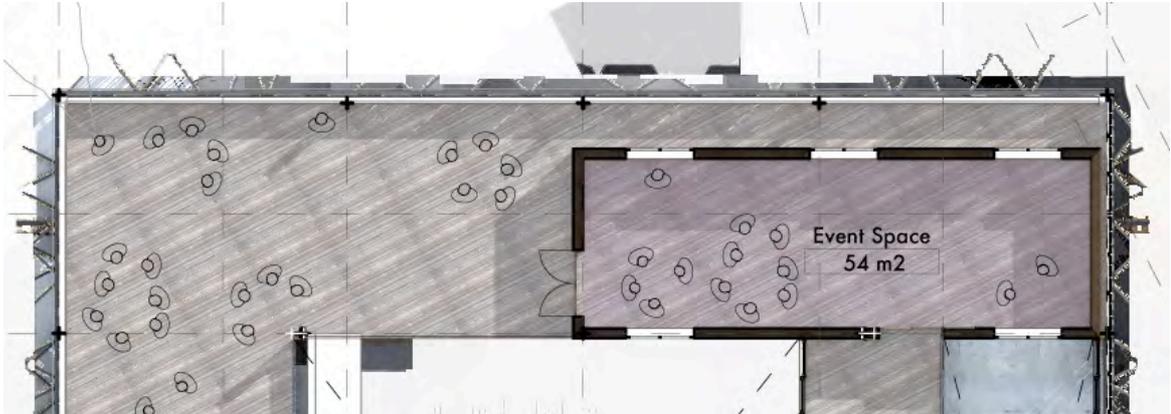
Detail of the event space plan showing the roof decking.
